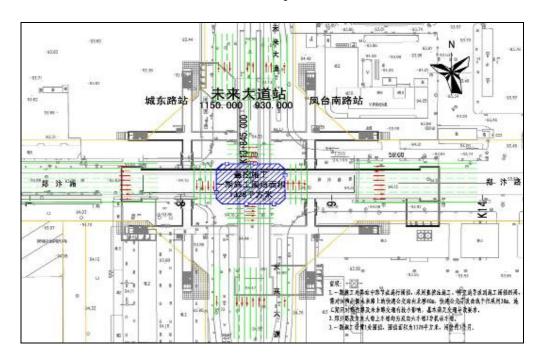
Traffic organization and construction fencing of the first phase on Weilai Road
